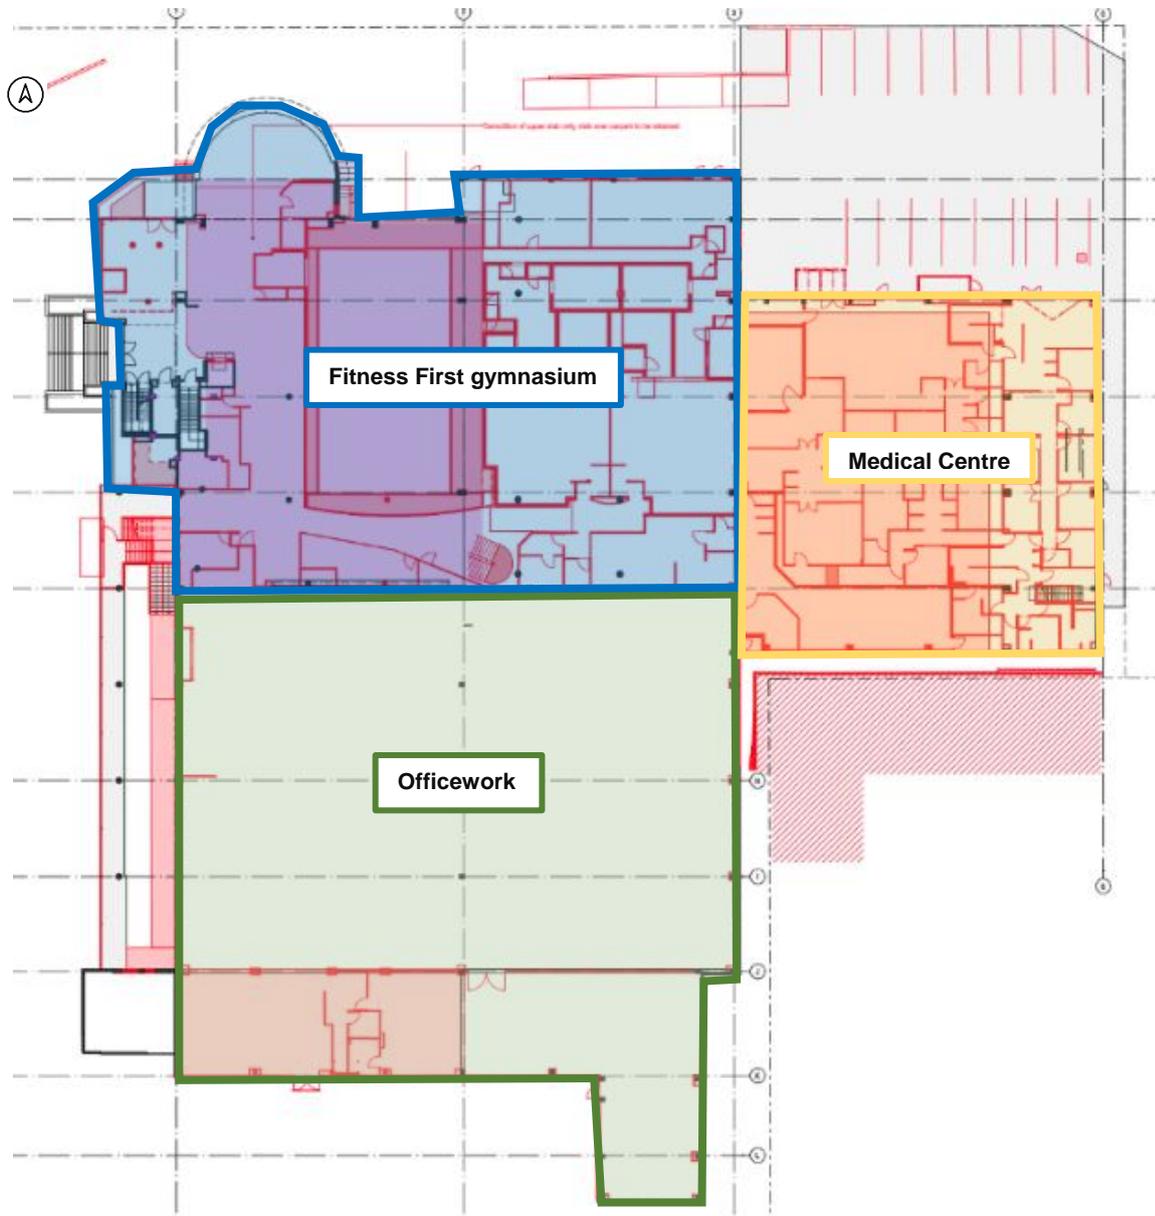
Excerpt from Level 1 Demolition Plan\_800 showing the retail and commercial tenancies within 800 Pittwater Road (Source: Tonkin Zulaikha Greer, drawing no. A-041, 23.08.2019).
